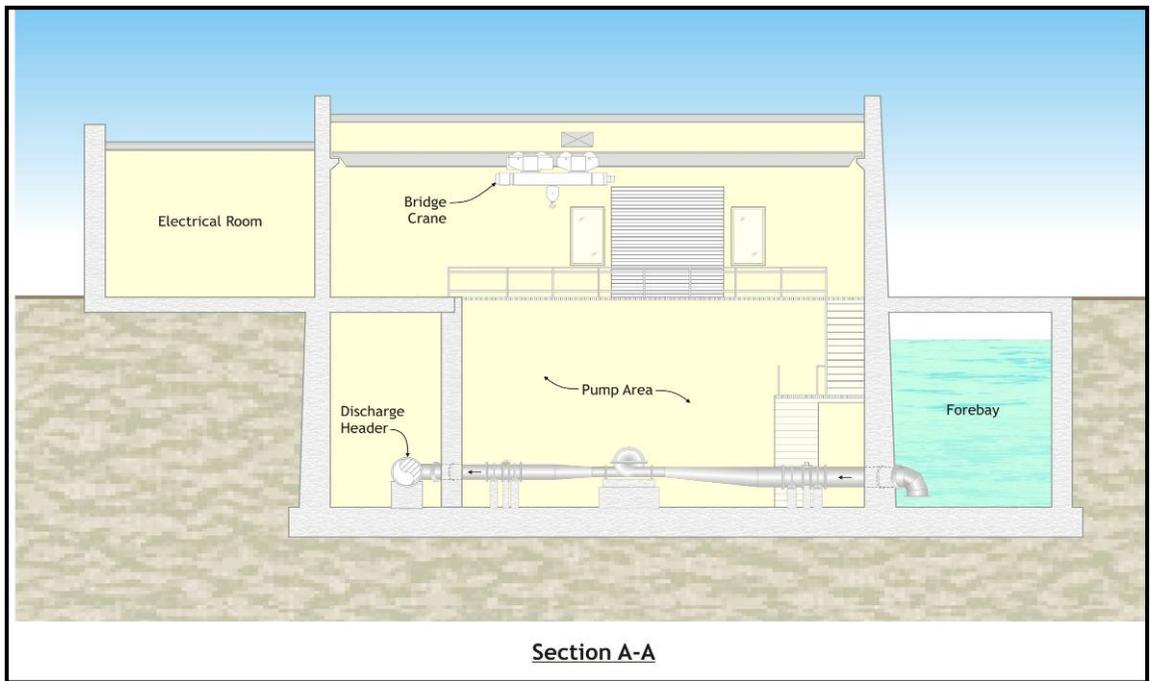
Pumping Station Layout, Preliminary Cross Section
